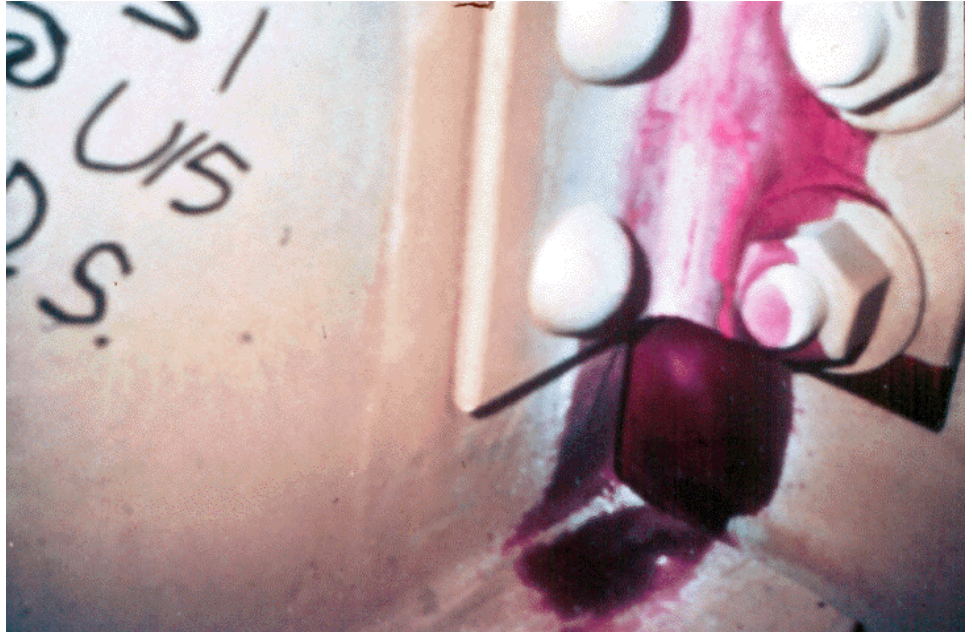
Detection of a Crack Using Dye Penetrant
